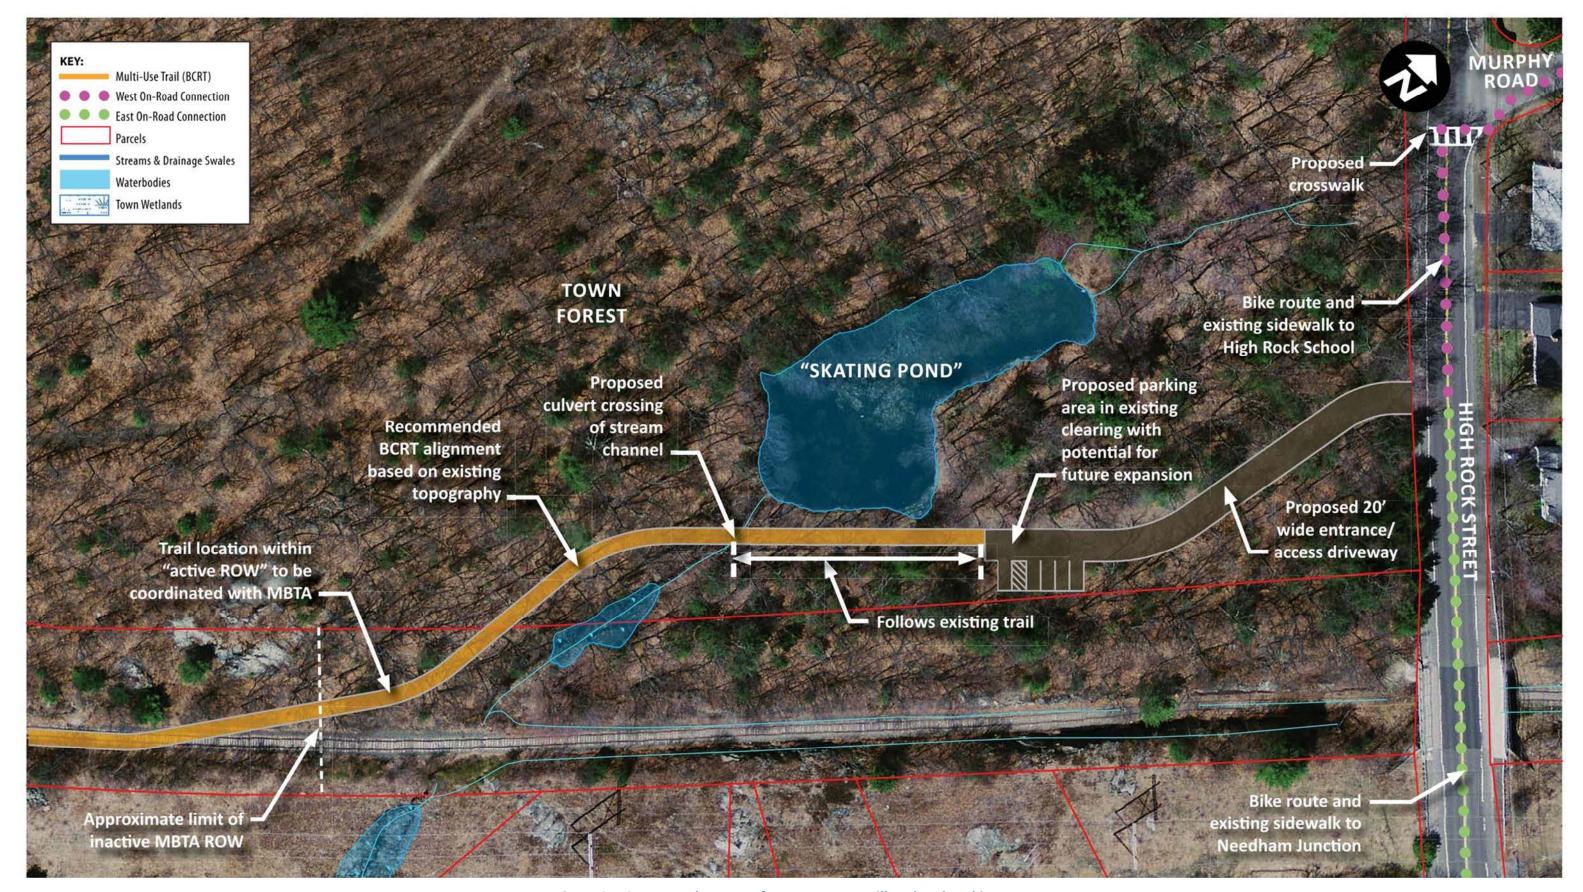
Conceptual Layout of Town Forest Trailhead and Parking Area
